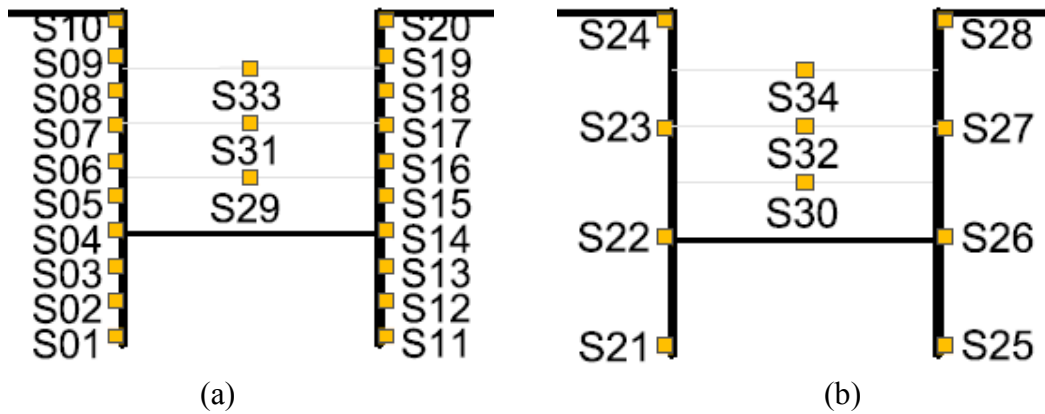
Elevation view of excavation strain gauges: (a) primary array; and (b) secondary array.
